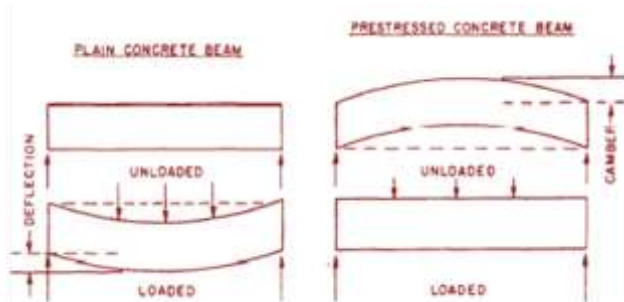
Comparison between Plain (RCC) and Prestressed concrete beam.
